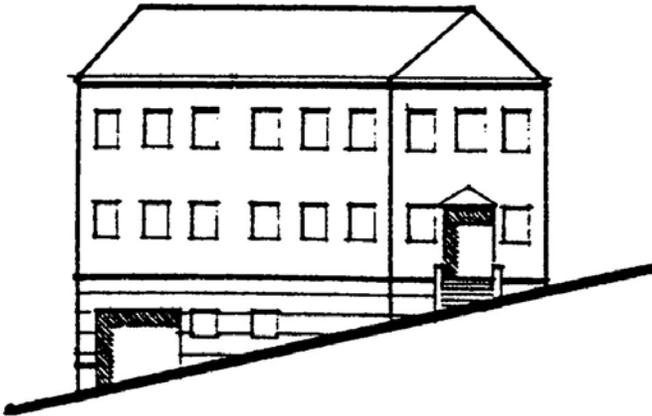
The parking garage entry should take advantage of topography to be visually subordinate to the pedestrian entry.
